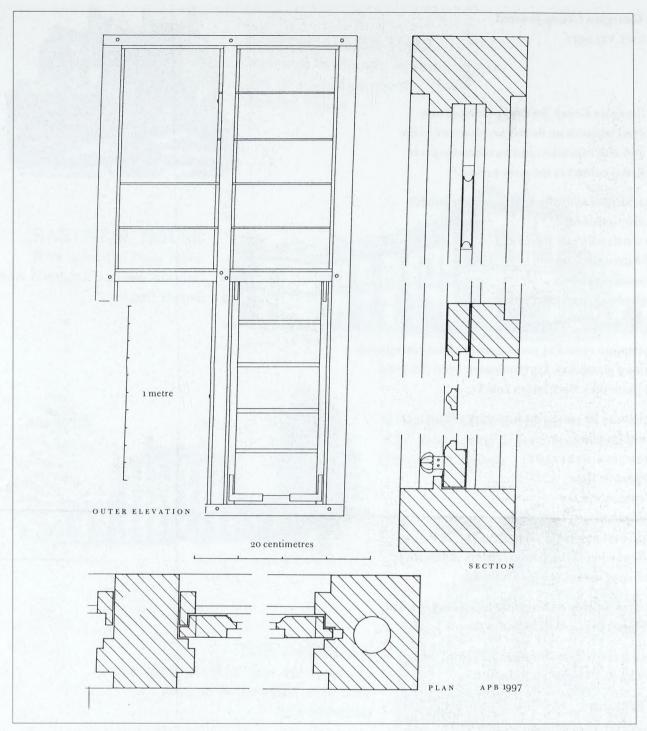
Newmarket Palace, first floor window, outside elevation, section and plan. A. P. Baggs.
